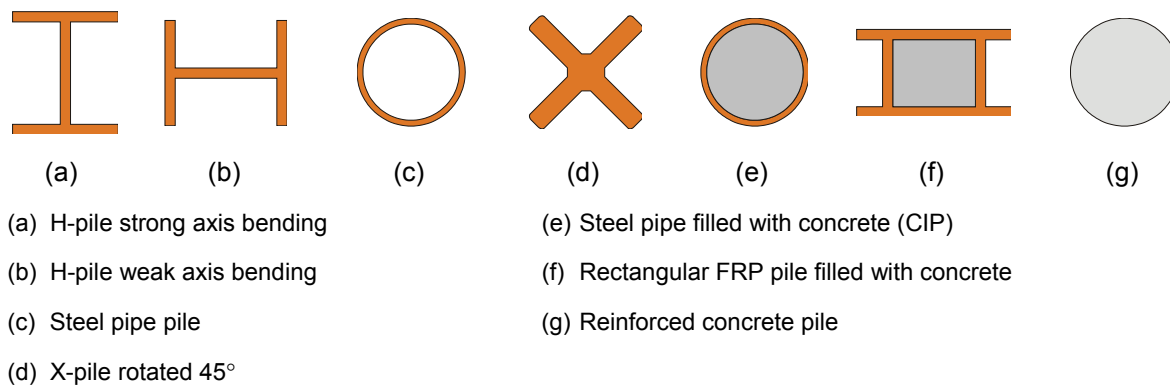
Illustration of different steel / composite pile / concrete cross-sections
